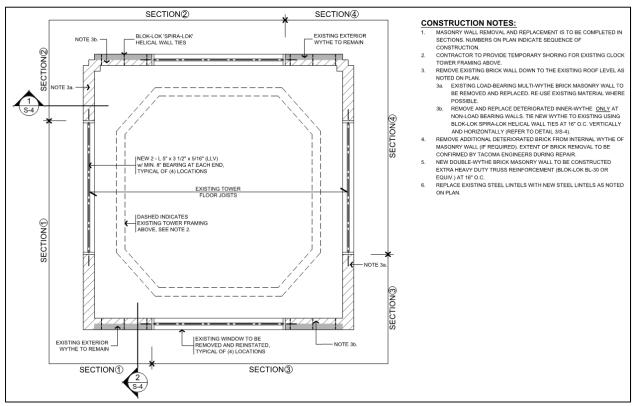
Original Scope of Brick Repair Work (September 23, 2013)
